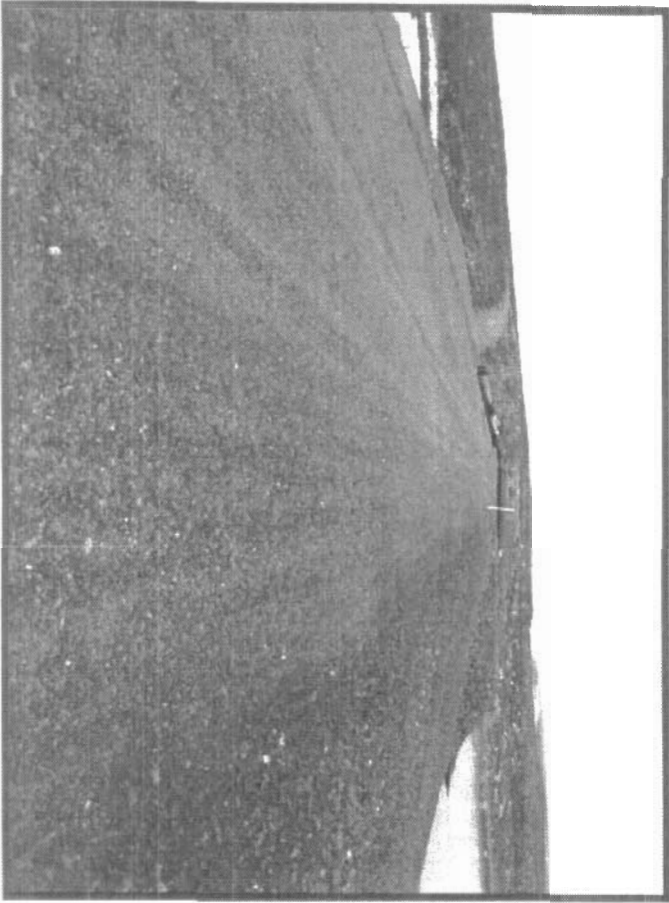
shows a view of the crest looking towards the north abutment. No signs of settlement, deformation or cracking noted on the crest.
